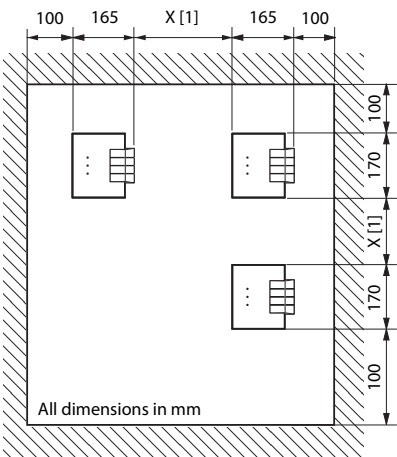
Dimensional drawing for wall-mounting the mounting bracket
